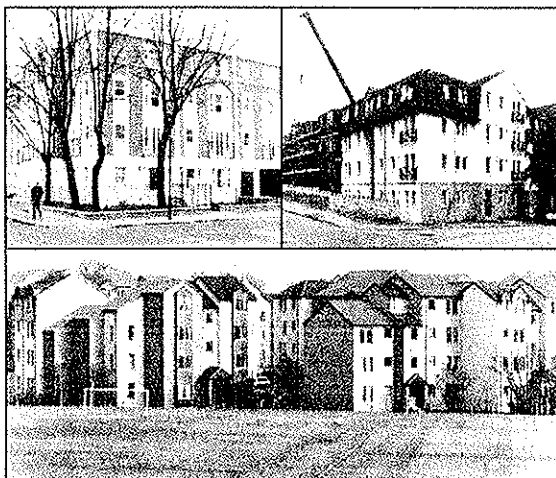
Some Examples of Existing Medium-Rise Timber-Framed Buildings
